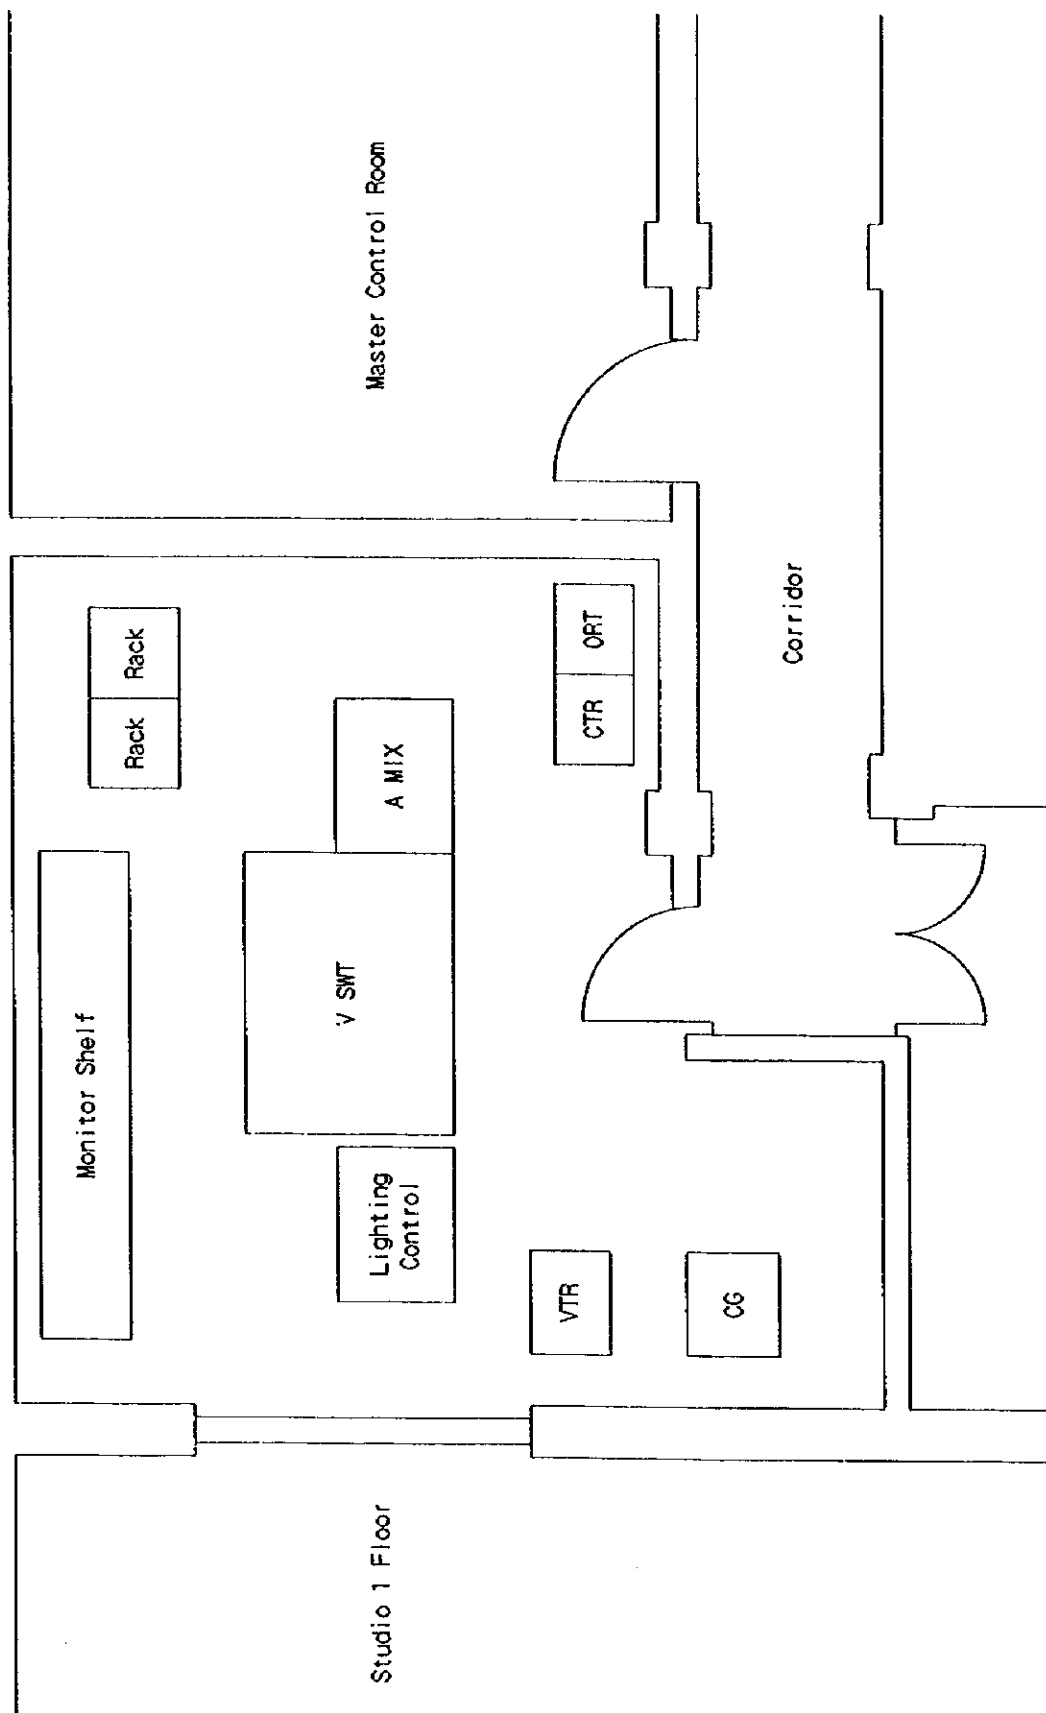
Equipment Layout of Studio 1 Sub-control Room
